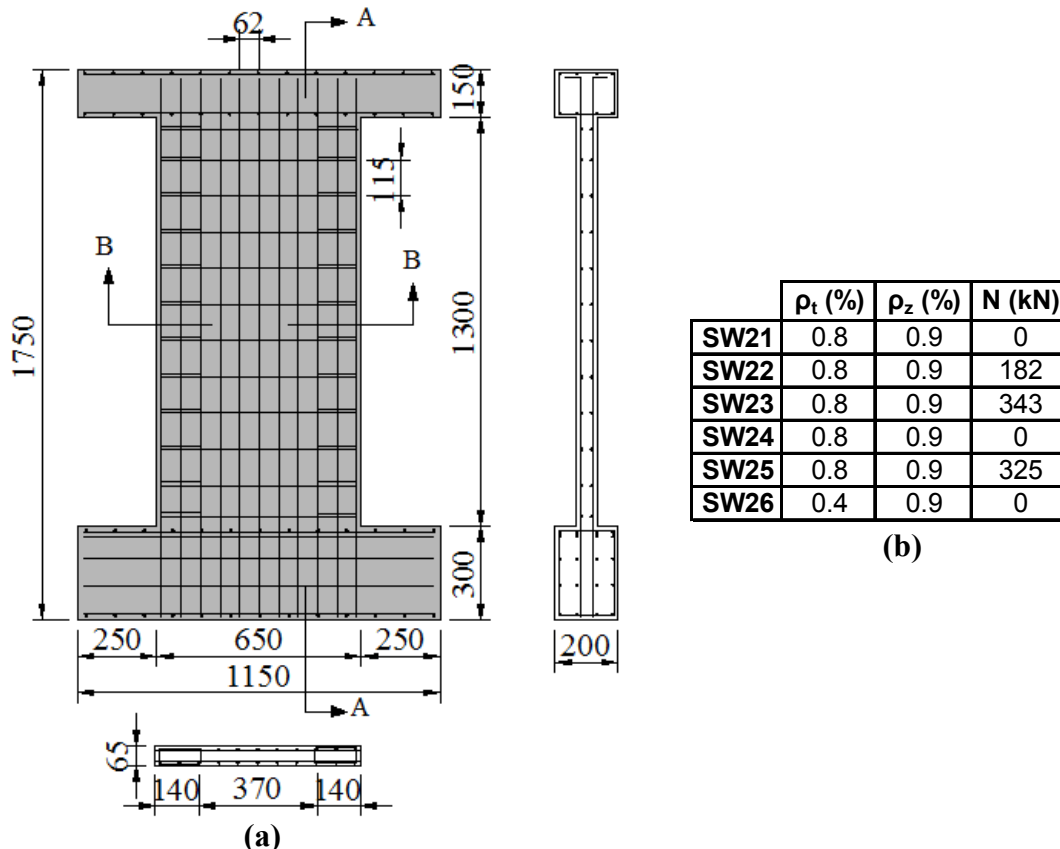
(a) Structural Details of the Lefas Type II Walls; (b) Reinforcement Ratios
